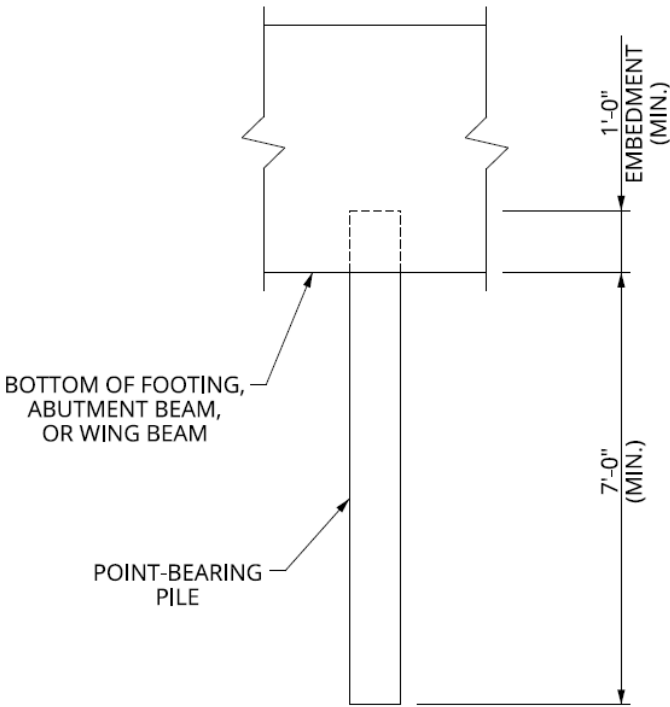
Minimum Point-Bearing Pile Length and Embedment
